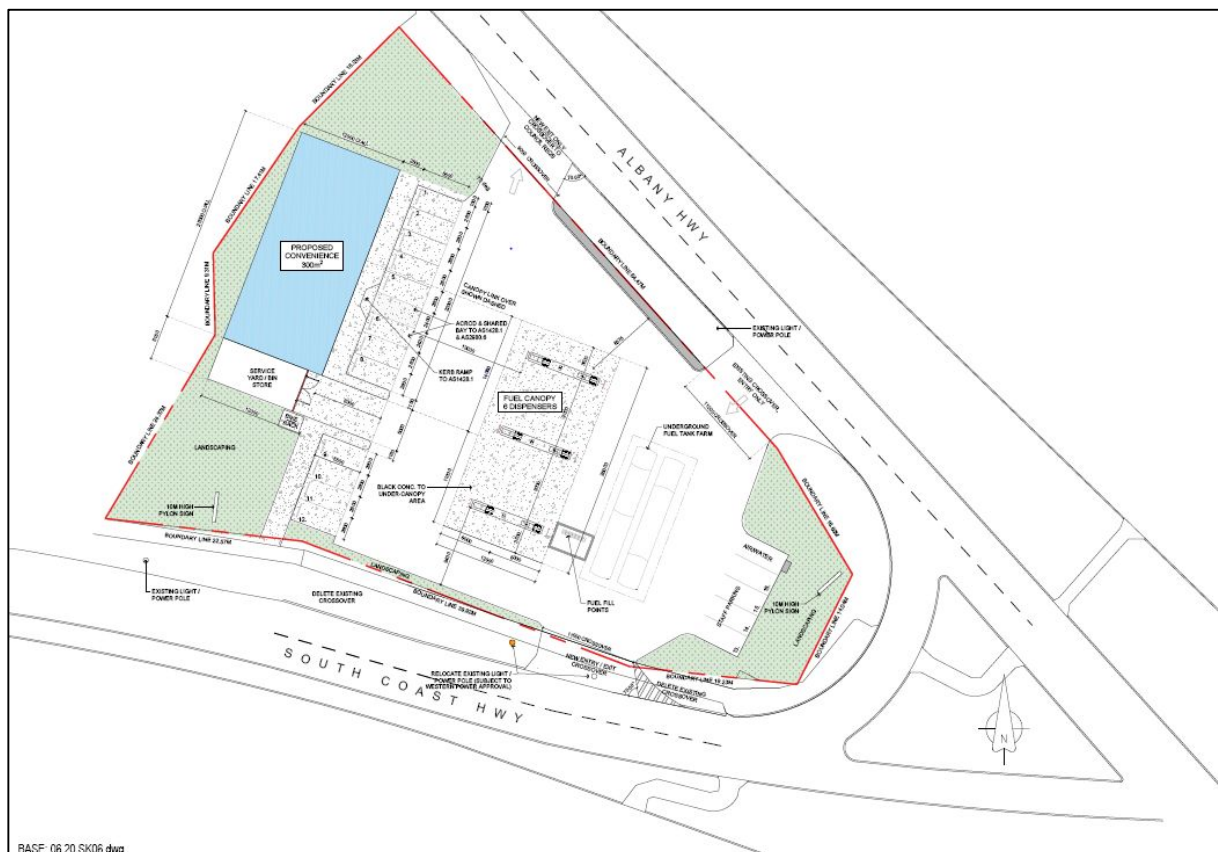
Proposed Site Layout Source: DVC amendments to Hodge Collard Preston Architects base drawing
